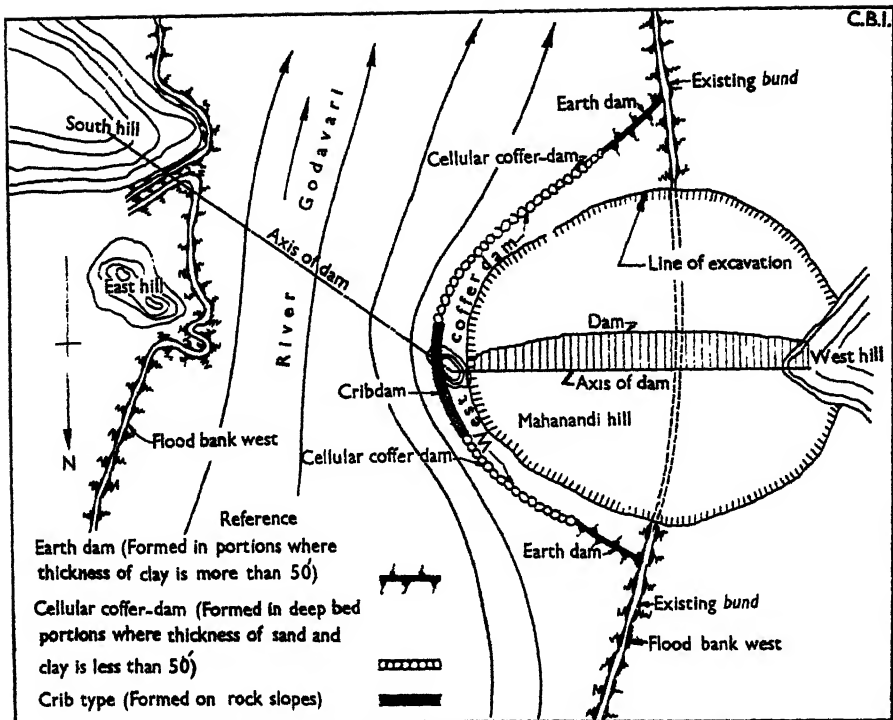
C.4(a):- Showing layout of Ramapadasagar west coffer dam
